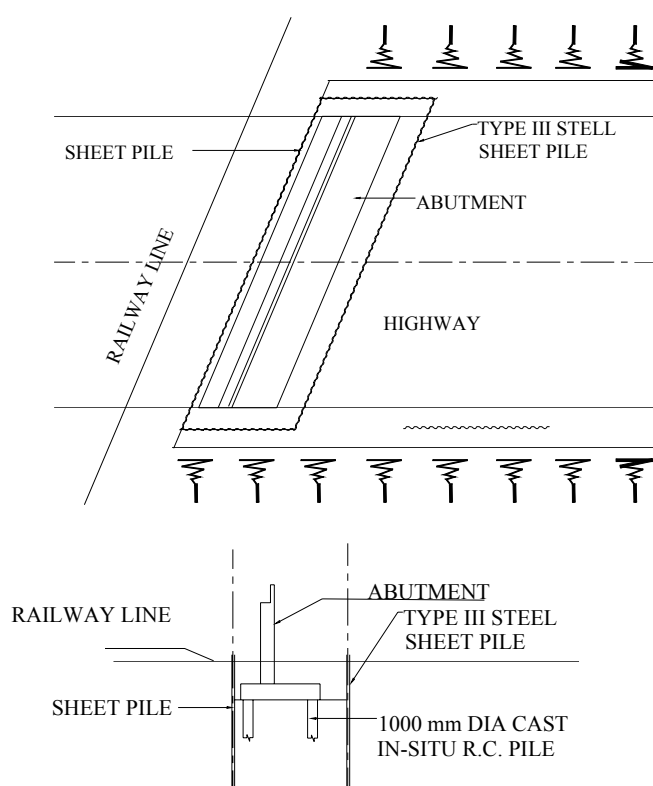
Sheet Pile Cofferdam for Substructure Near Railway
